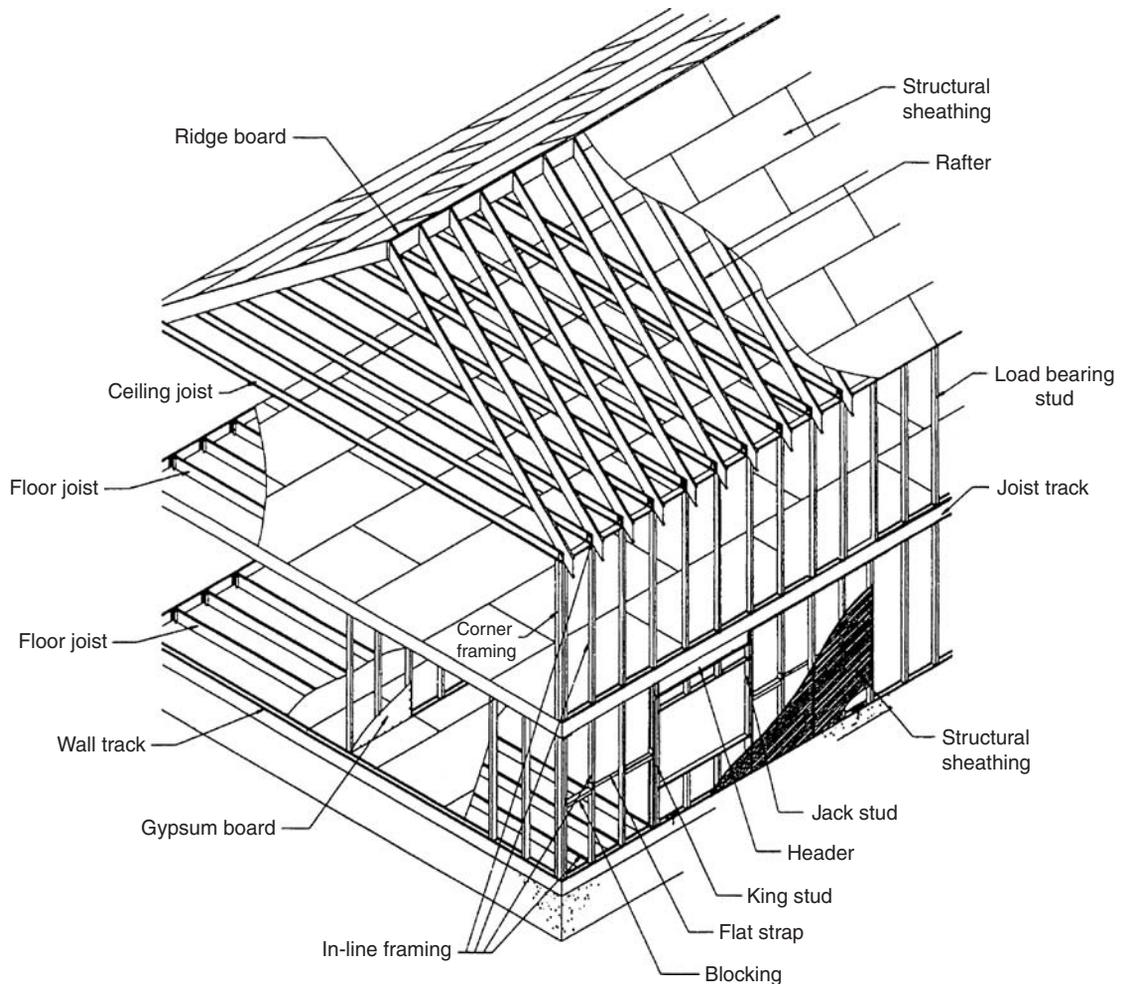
Steel framing in residential construction. (Source: Prescriptive Method for Residential Cold-Formed Steel Framing, 2d ed., NAHB Research Center, Upper Marlboro, Md., 1997, with permission.)
